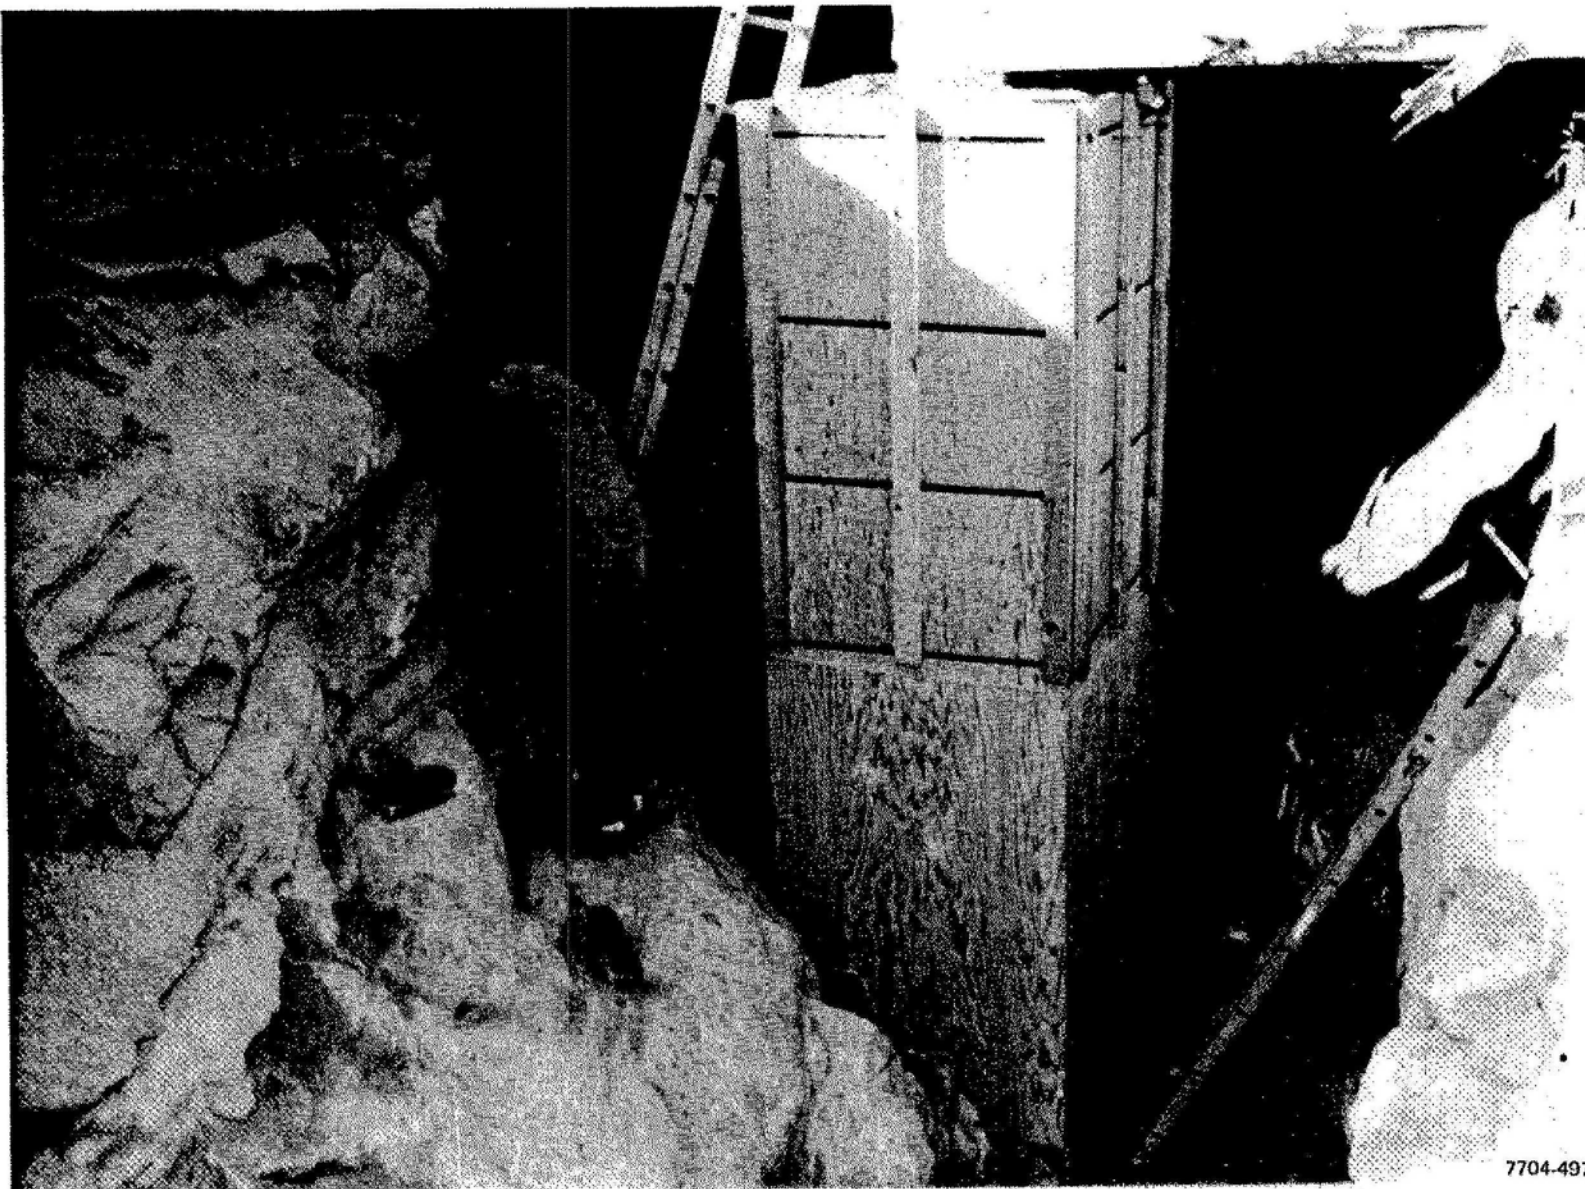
SRE High-Bay North Wall Column Supports Interior View
